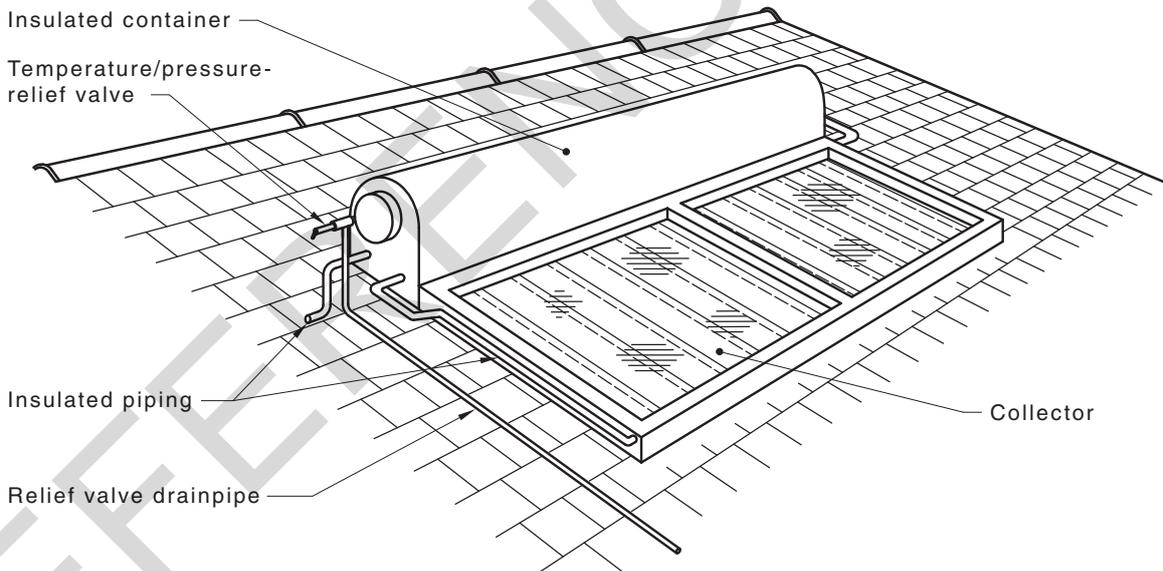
F2.1~~ 'WITH PITCH' INSTALLATION
